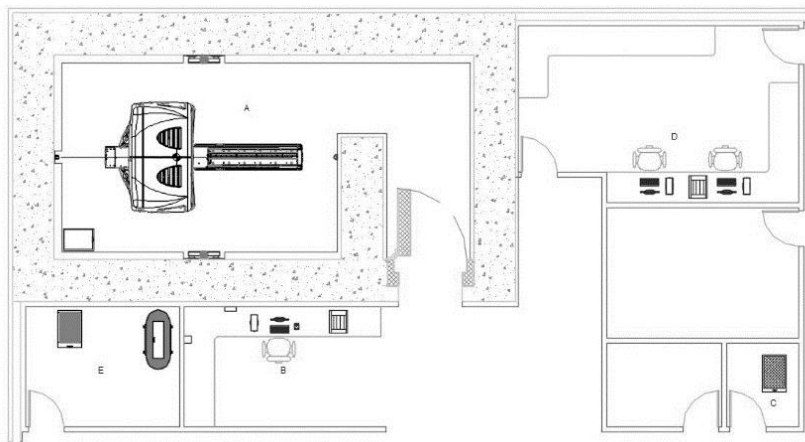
Typical TomoTherapy Floor Plan with Maze Walkway
